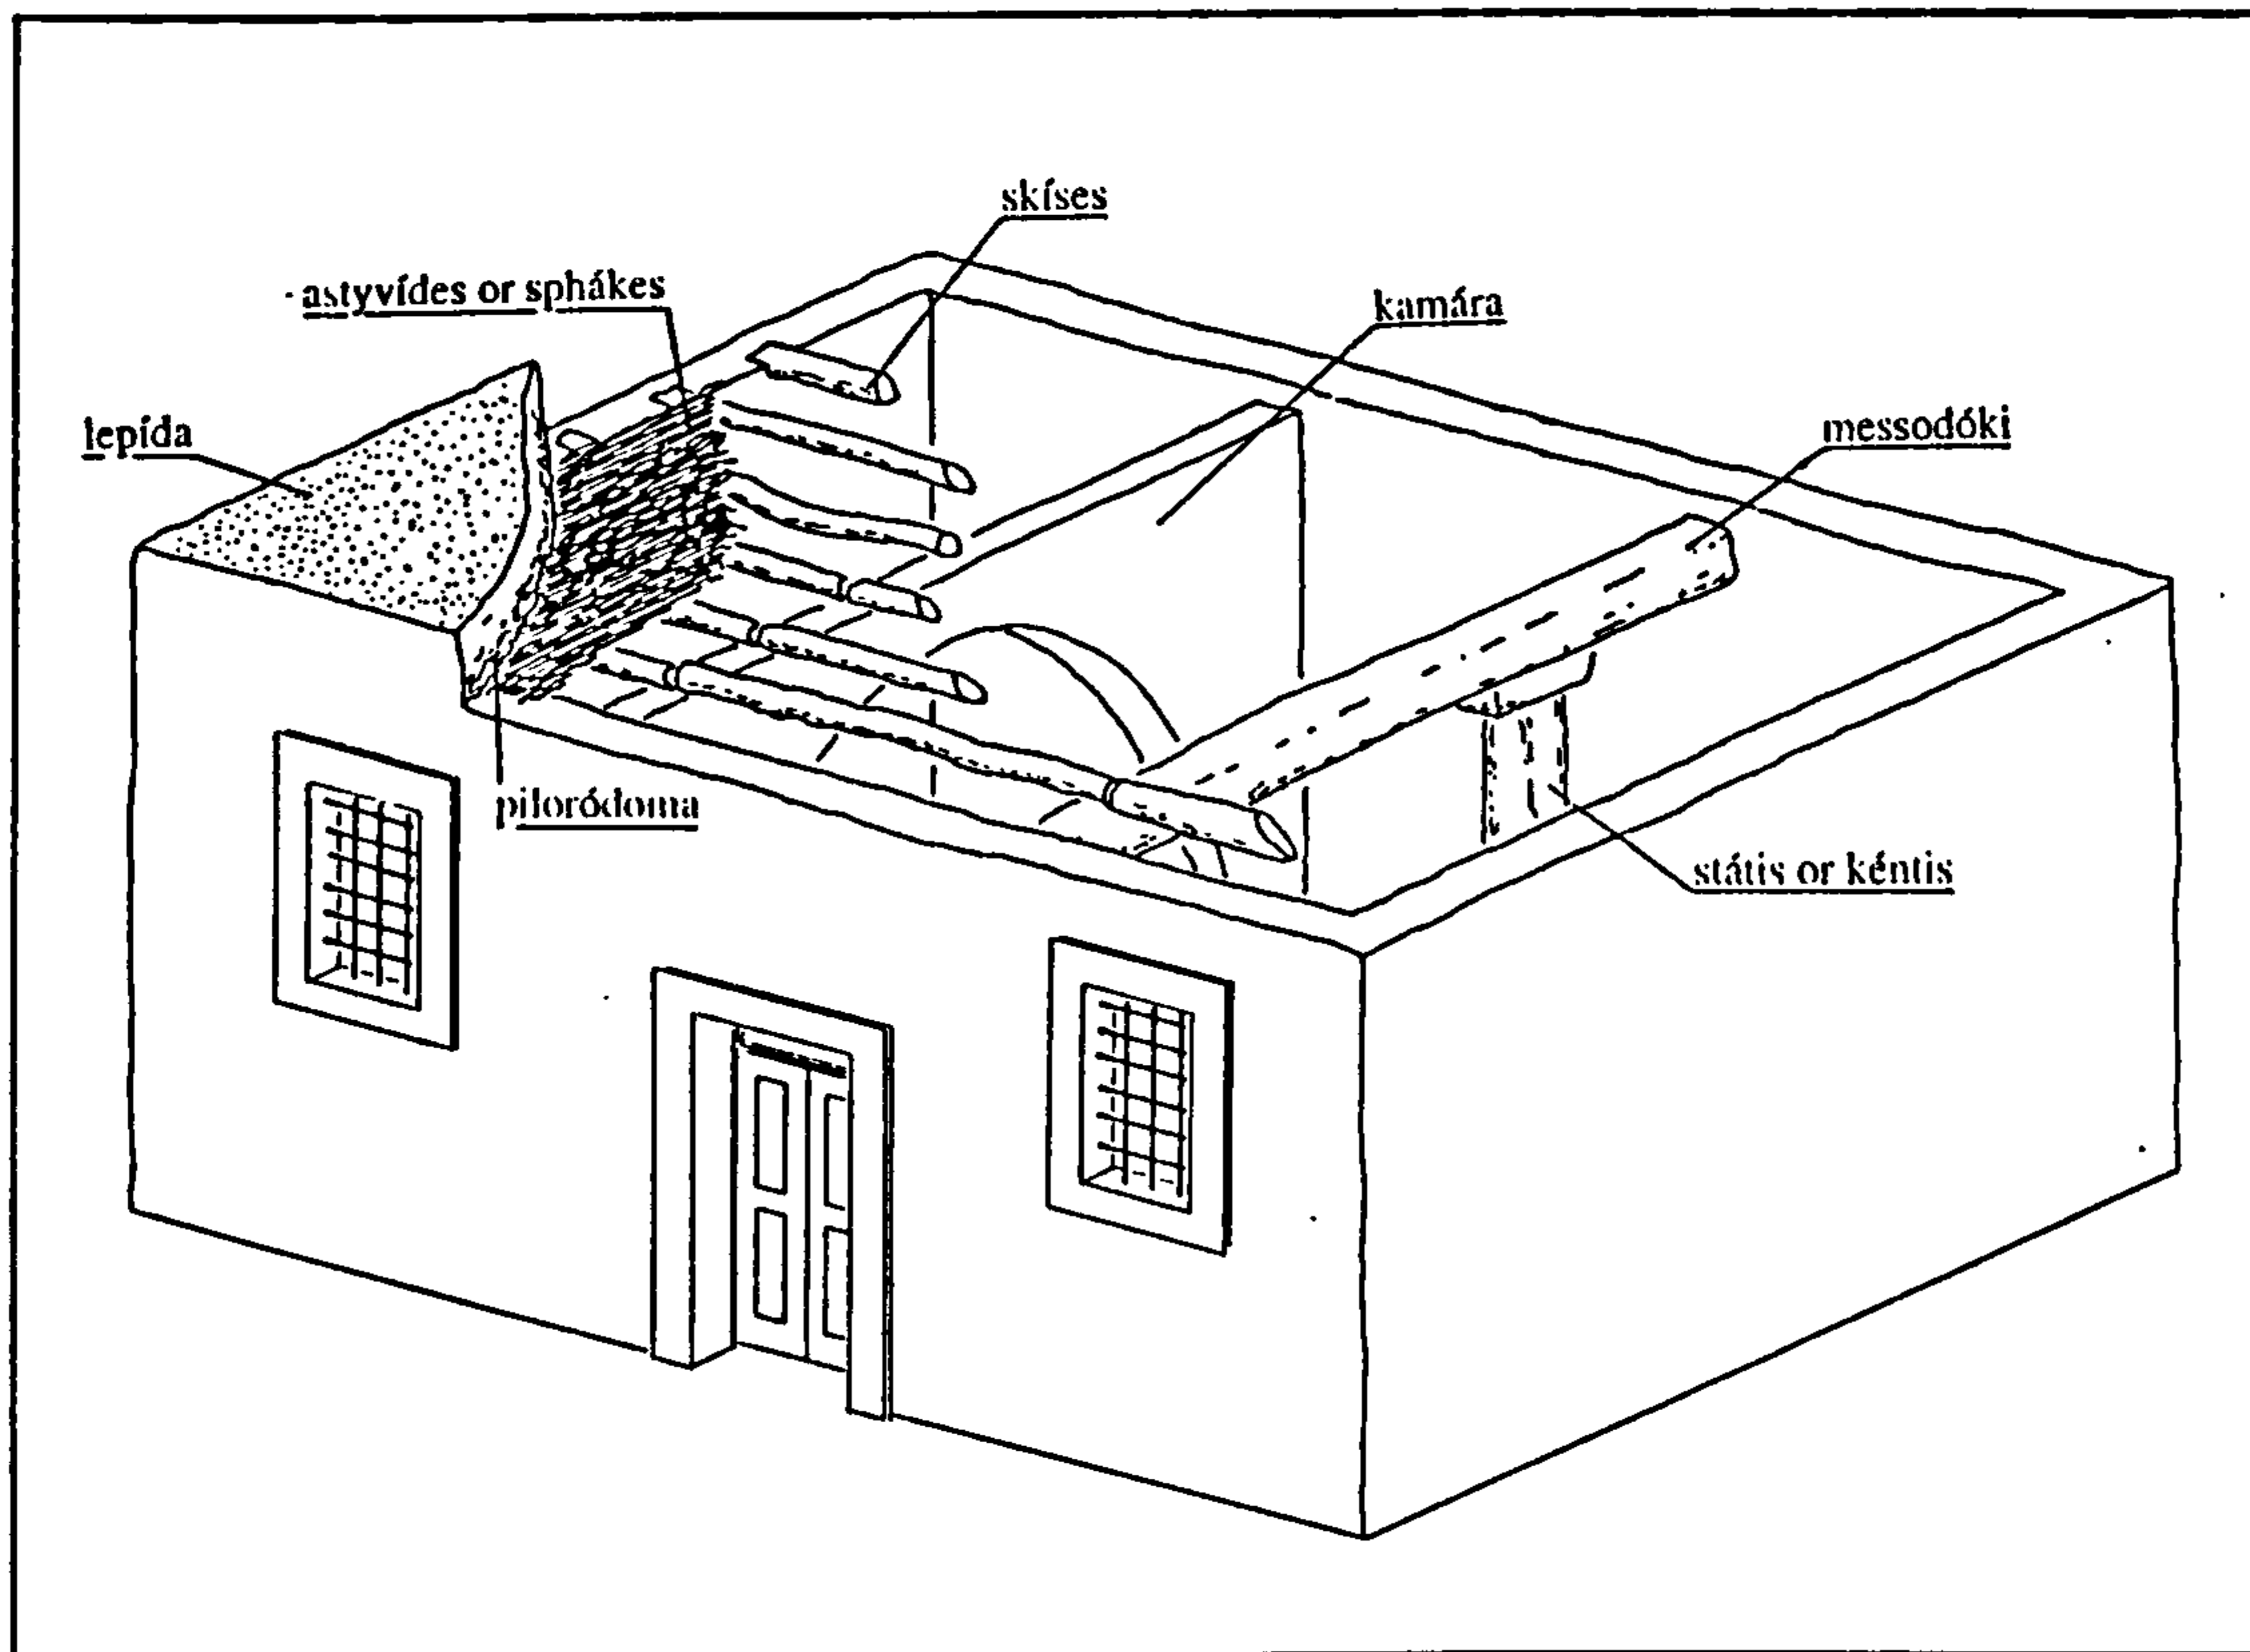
Schematic drawing of ceiling construction for a vernacular Cretan house.
